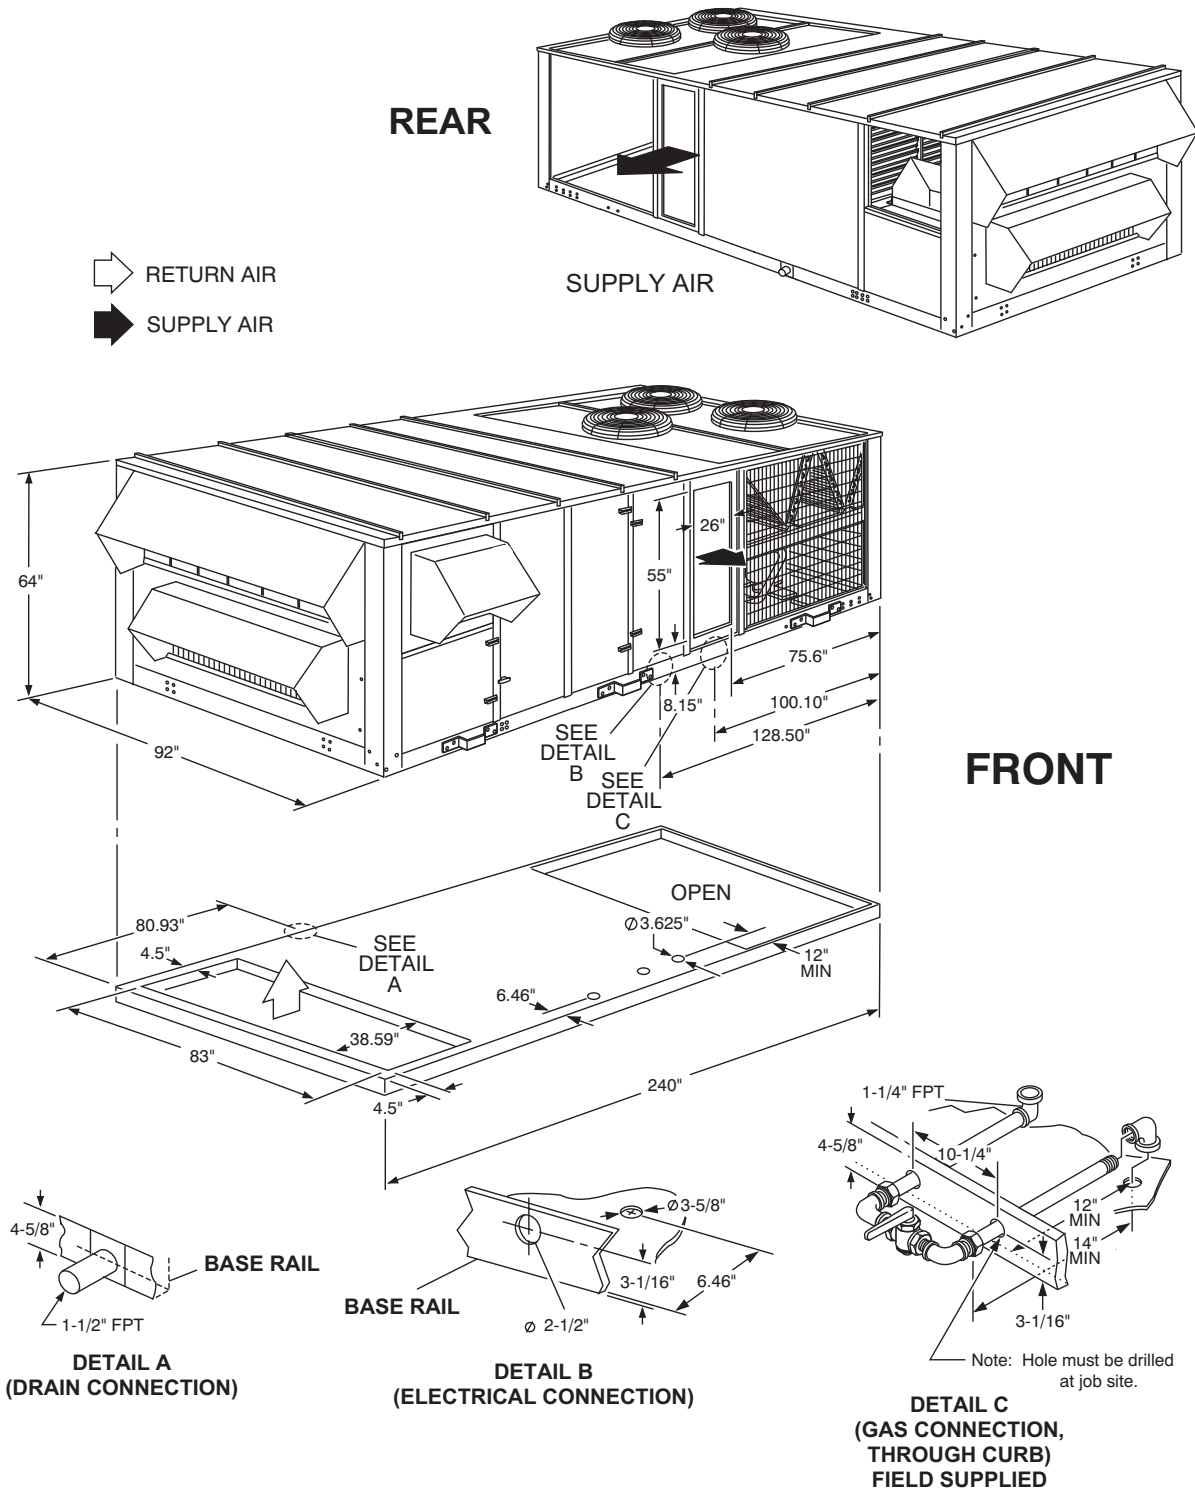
BOTTOM RETURN, FRONT & REAR SUPPLY
